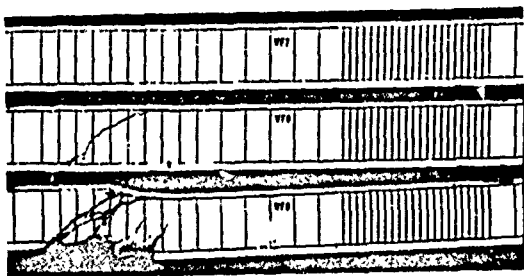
Post test photograph of dynamically loaded beams WF7 and WF8 and statically loaded beam WF9.
